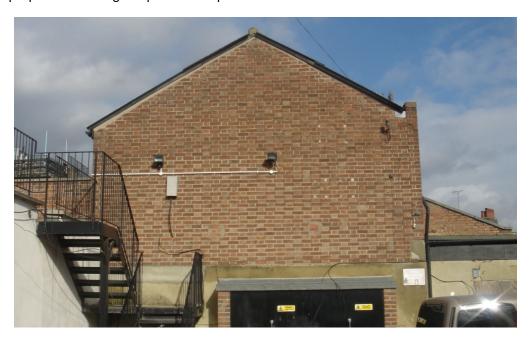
Principle elevation from Private Access Road off Gottfried Mew.
